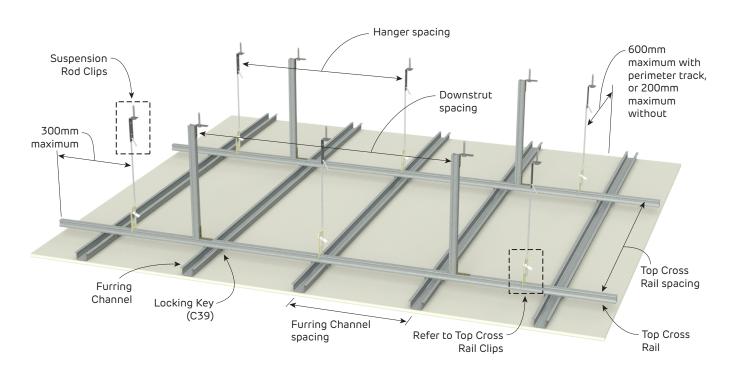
Suspended Ceiling Frame with DownstrutsPerspective
